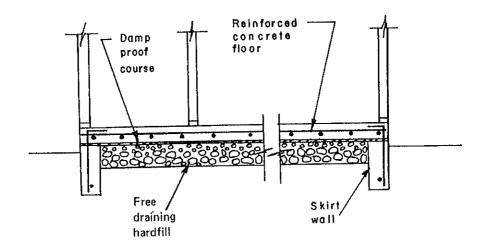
CONCRETE FLOOR FORMING A RAFT FOUNDATION
